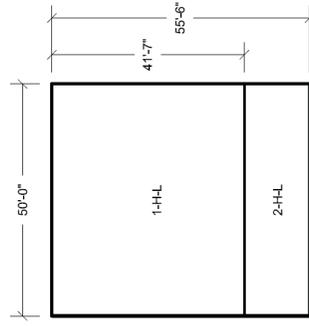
H.6-117. COOLING TOWER WEST WALL LOOKING EAST
